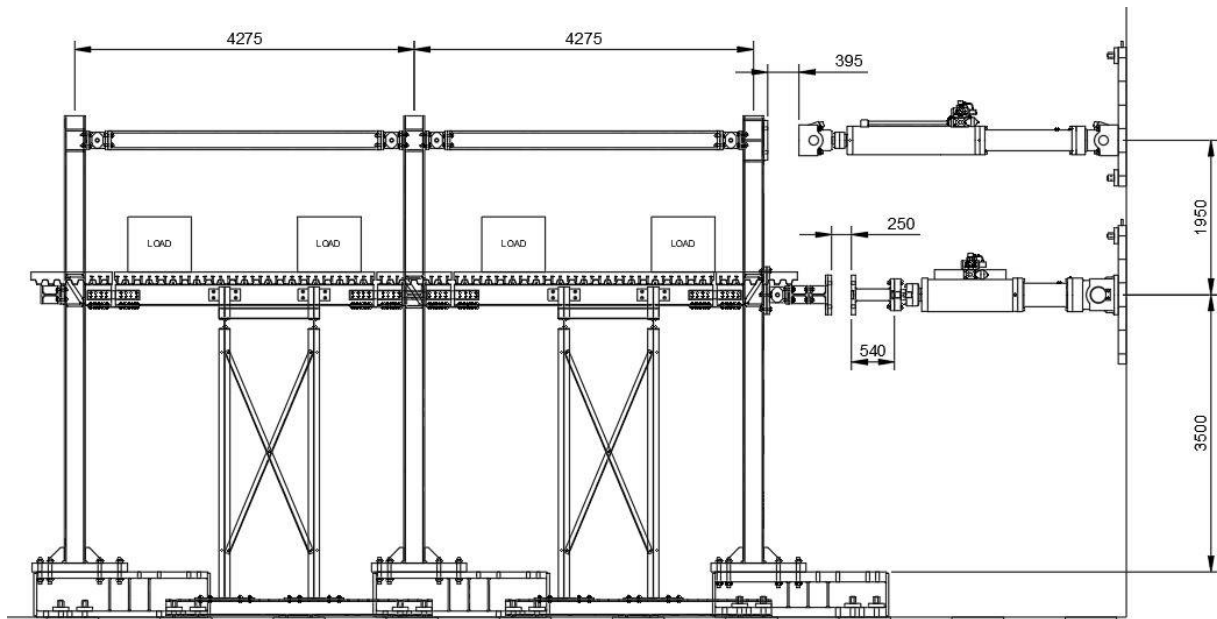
Experimental test set-up for test on DRD3 frame – Front view
